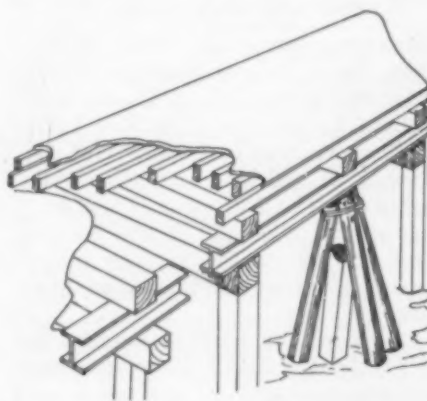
TIMBER PILES REPLACED BROKEN CONCRETE IN PIER RECONSTRUCTION
